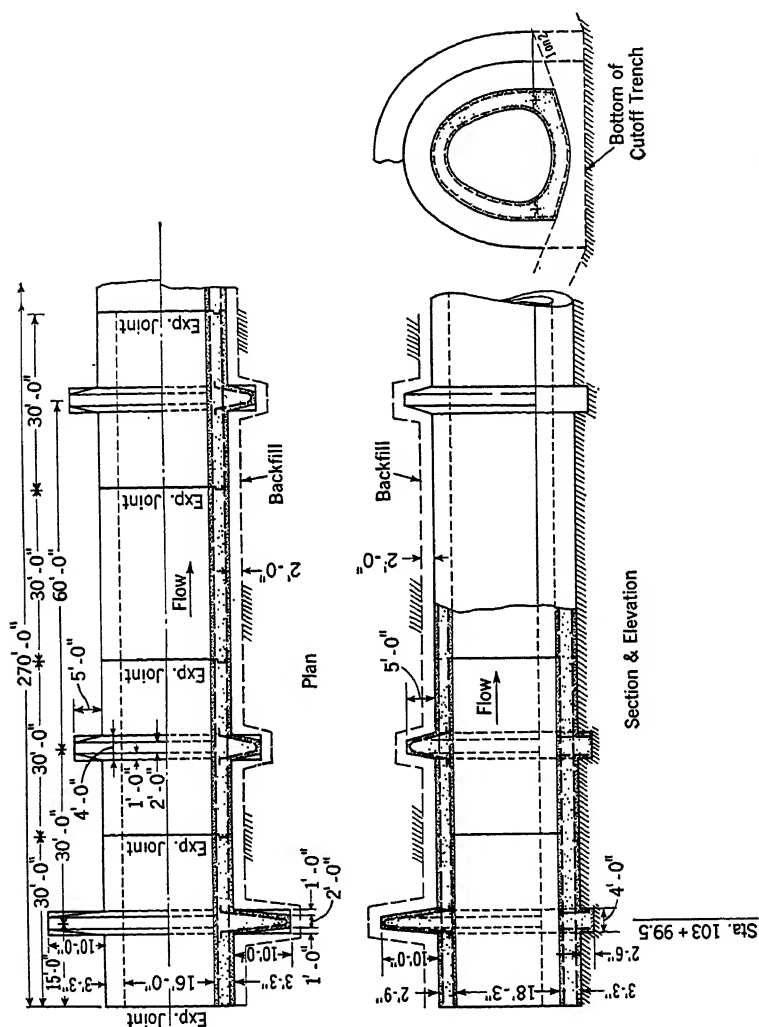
Suitable protection against seepage along conduit. Cutoff collars at Sardis Dam. Refill around collars and conduit tamped in place by air tampers.
